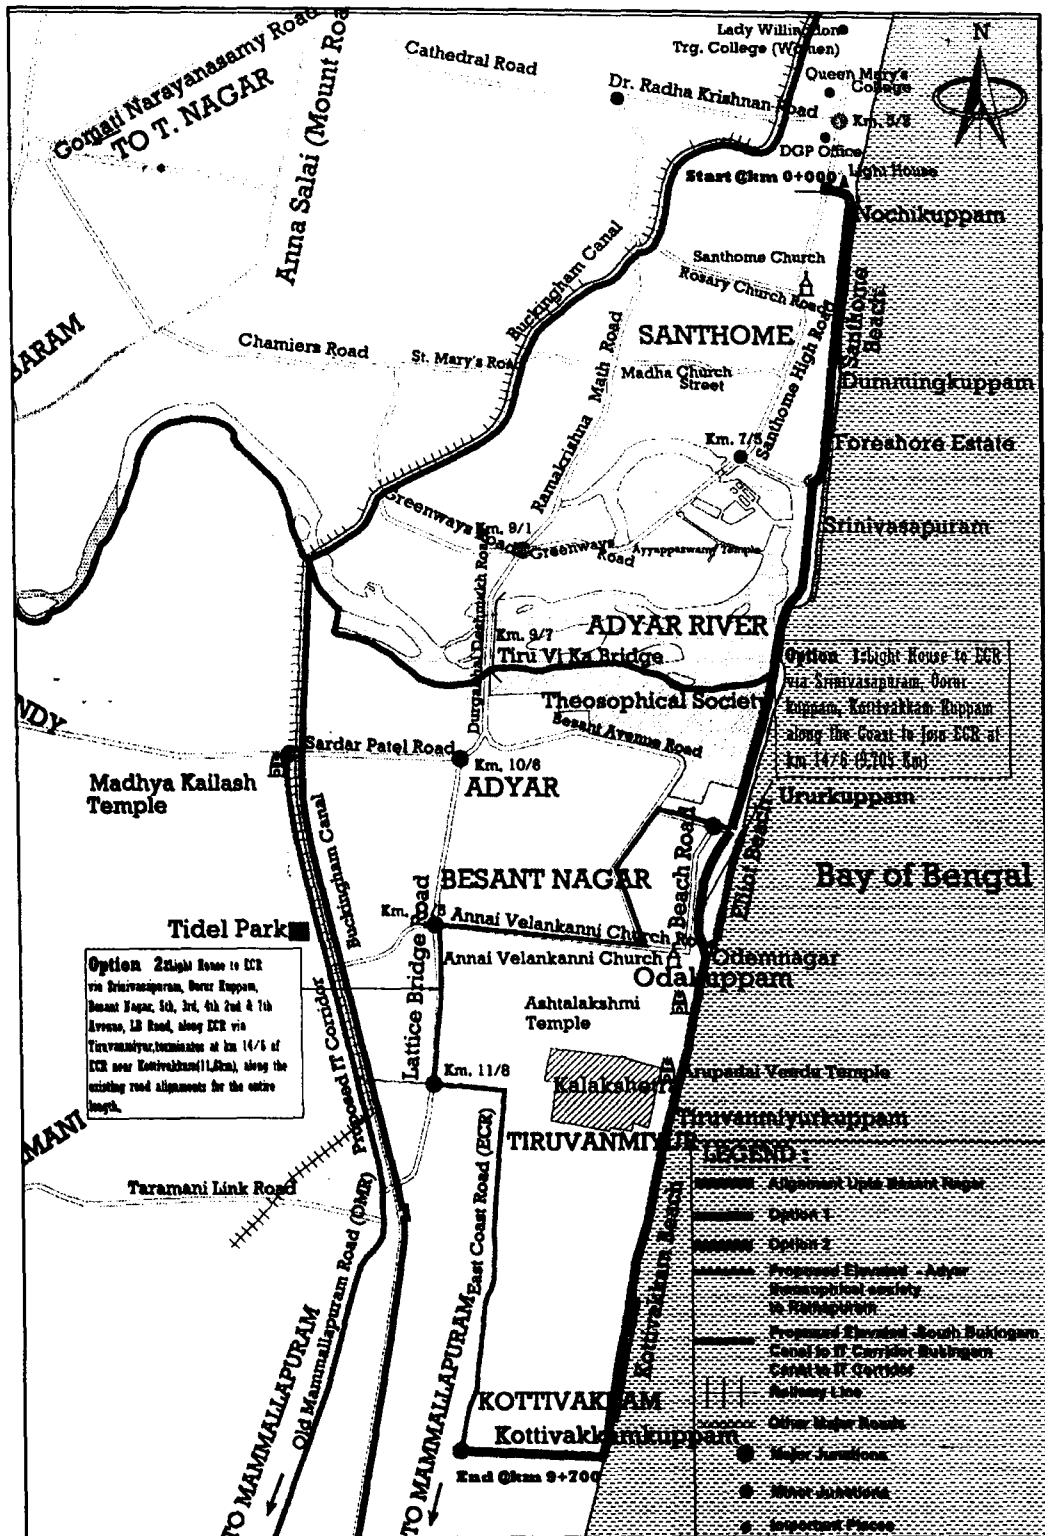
Alignment Options for Elevated Road between Light House and ECR
